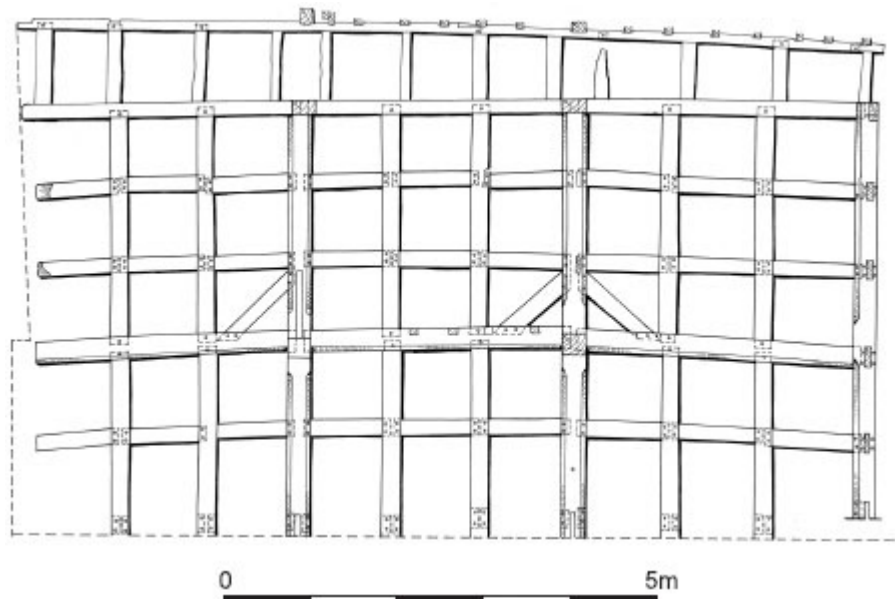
The inner face of the eastern side-frame of 26 High Town, showing it survives intact above first-floor level. The limited use of tension braces in the framing is noticeable. The attic section of the framing is a later addition
